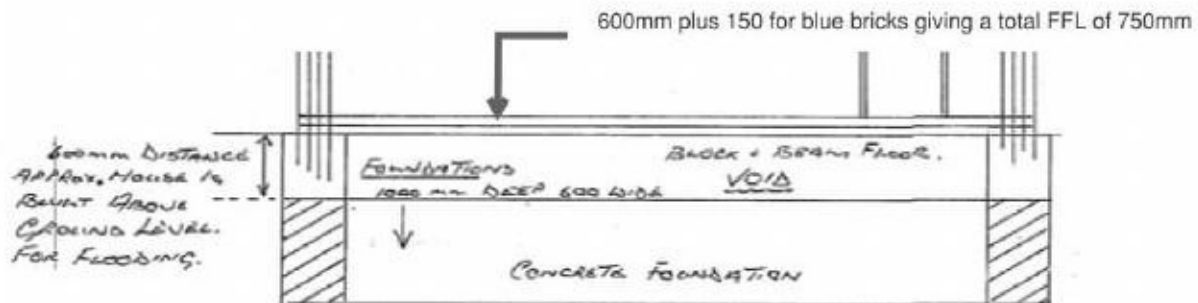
PROPOSED SECTION THROUGH BUILDING AND EXTERNAL GROUND LEVELS
